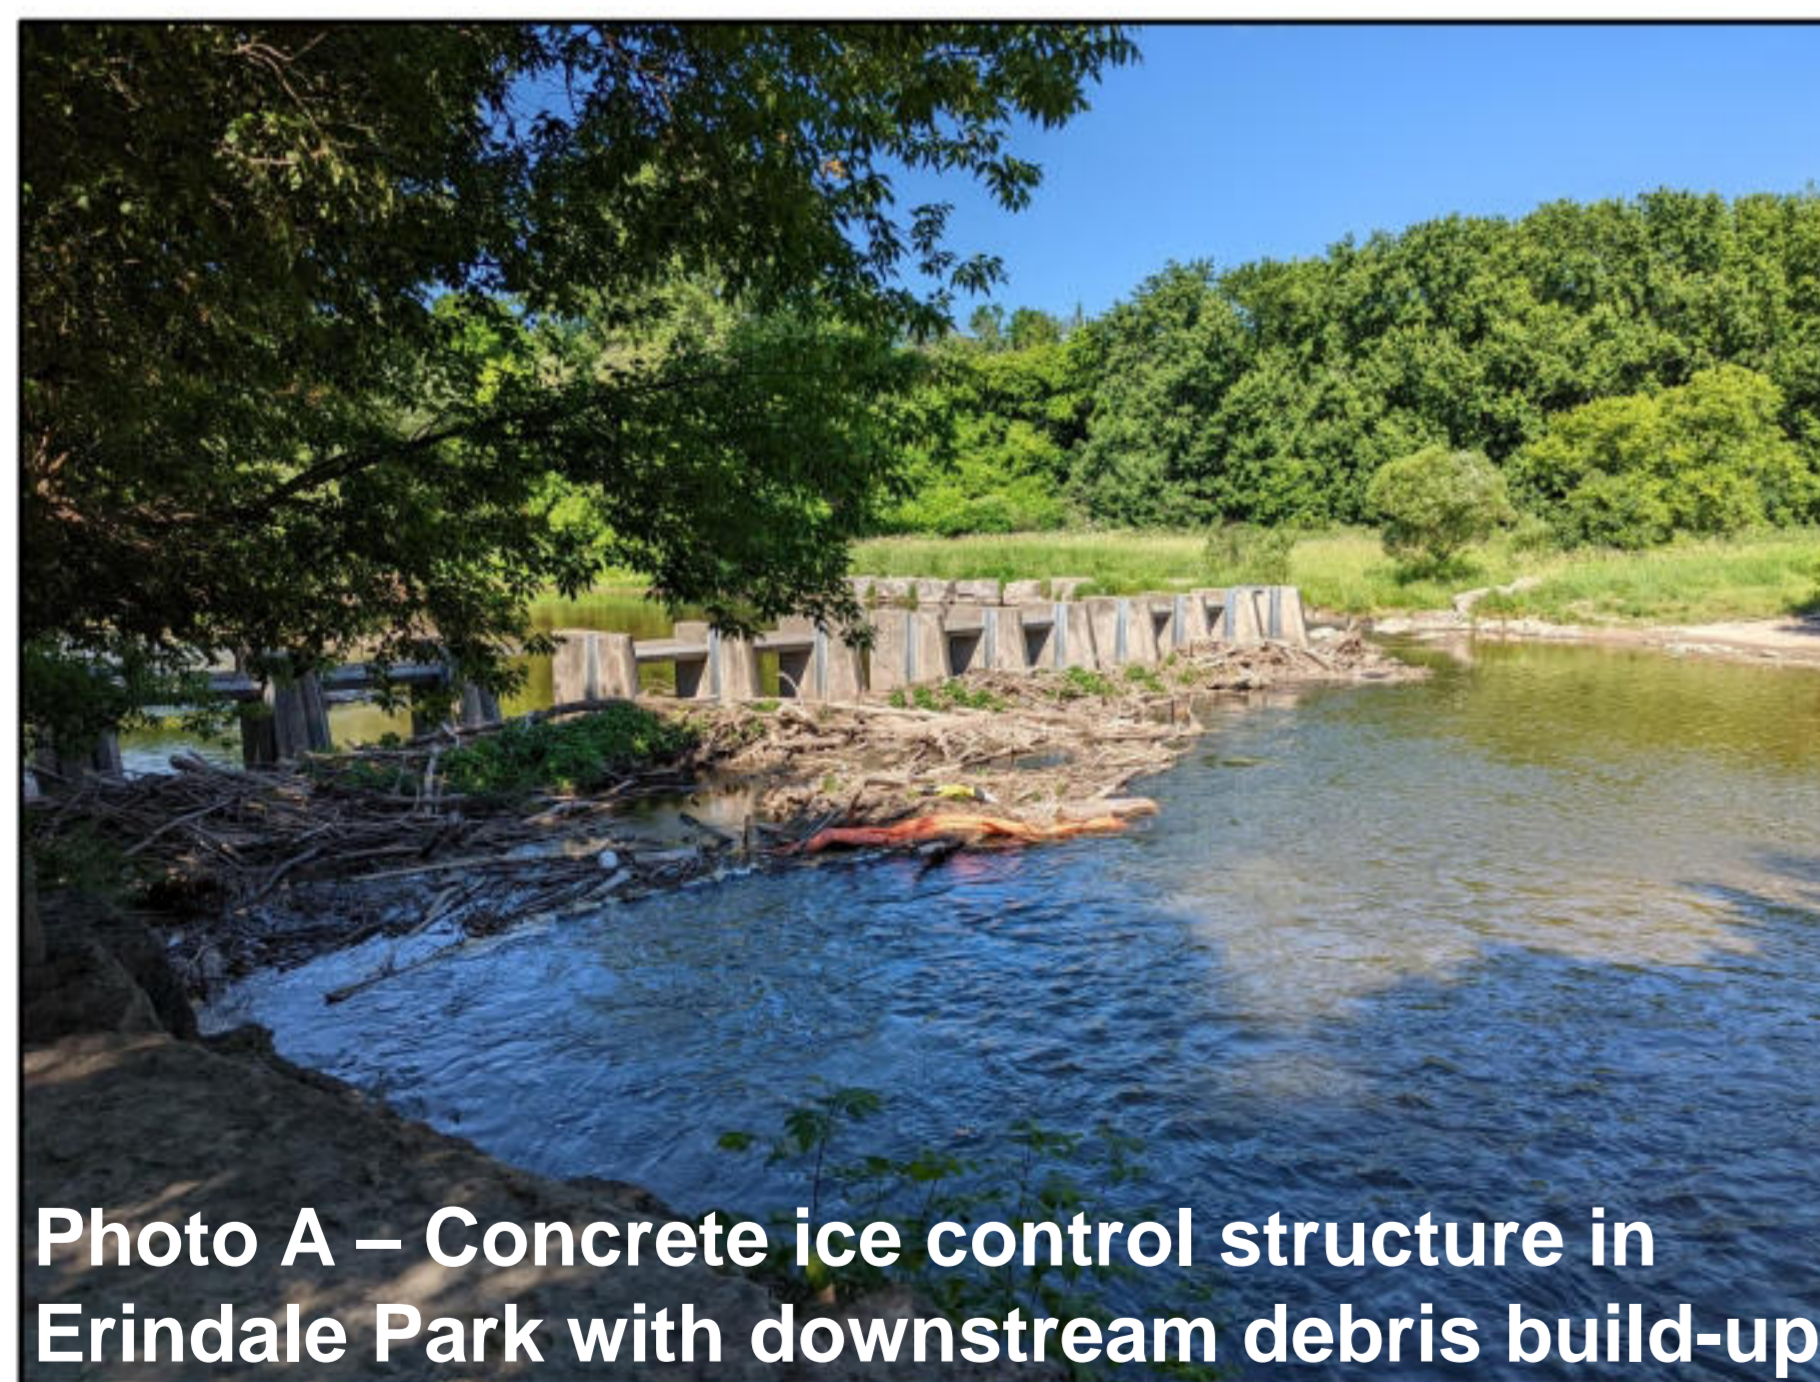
Photo A – Concrete ice control structure in Erindale Park with downstream debris build-up
